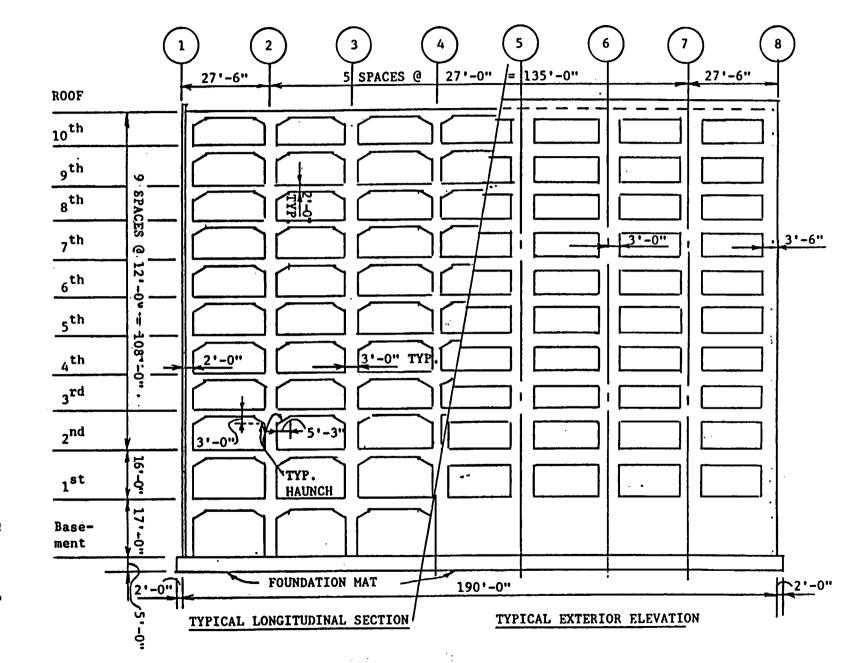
Building with concr moment-resisting frames and shear walls. (Sheet 5 of 32)
